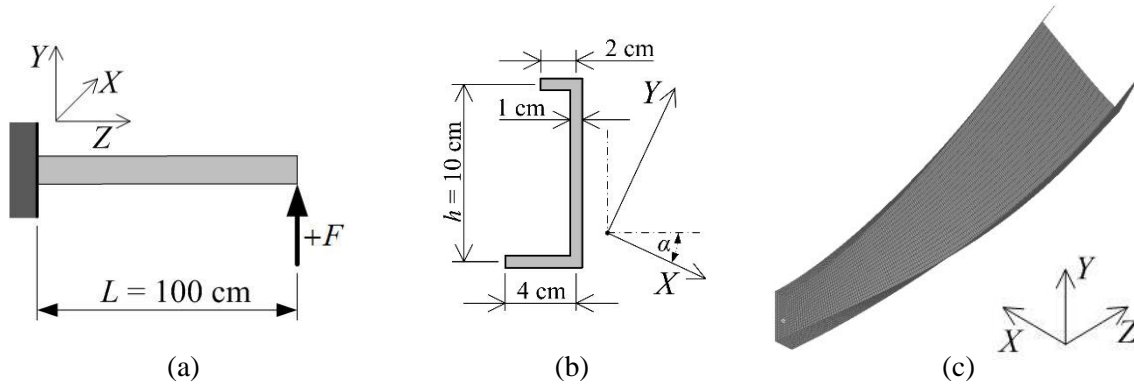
Cantilever beam: (a) geometry, (b) cross-section, (c) lateral-torsional buckling mode
